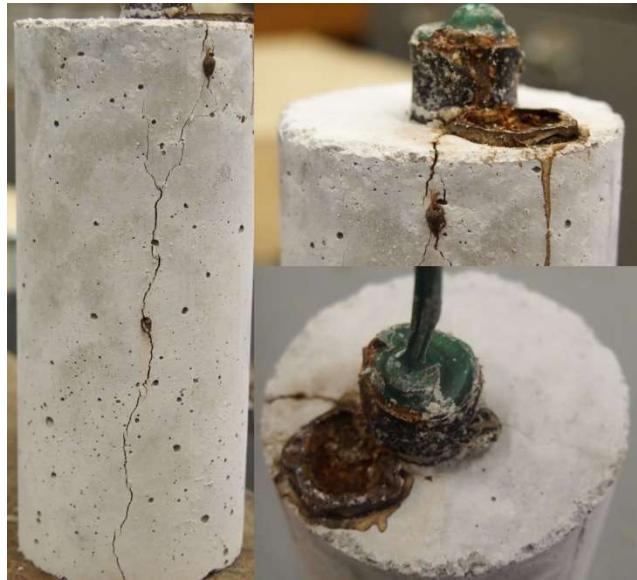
RST 7.5-300 Batch – XM-28 AR 6.8 Corrosion Products Cracking the Concrete Specimen
